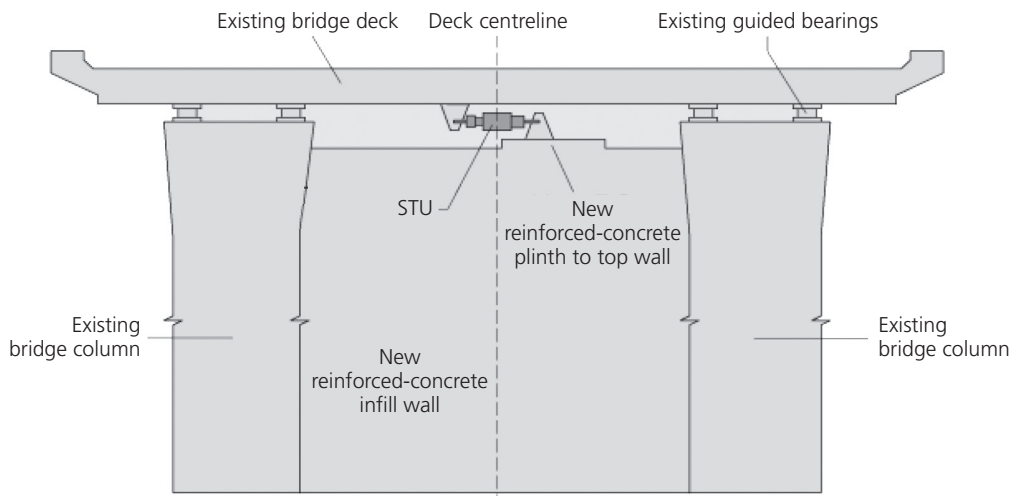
The strengthened pier with the reinforced-concrete infill wall and an STU installed in the transverse direction on the Barham Road Bridge. © Colebrand International Ltd
